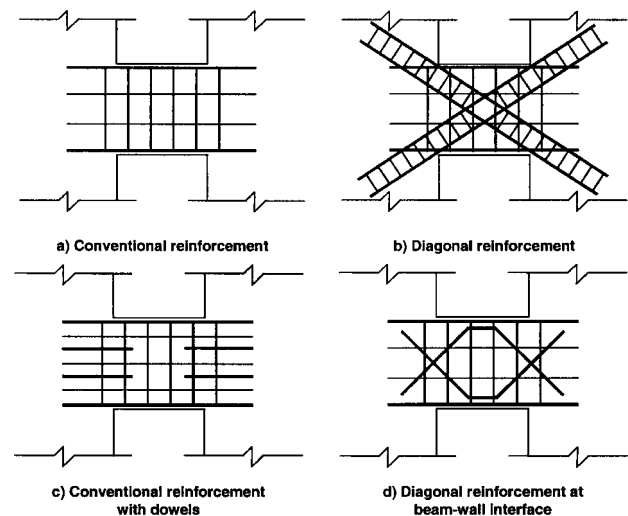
Reinforcement details in reinforced concrete coupling beams.
